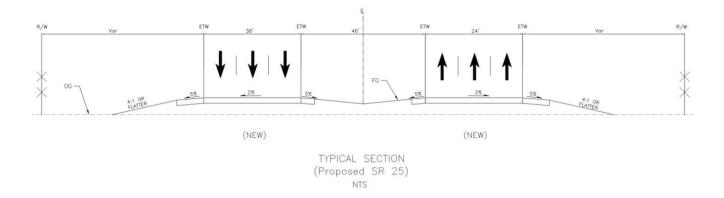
Proposed SR 25 Typical Section (West of New Roadway Section)
